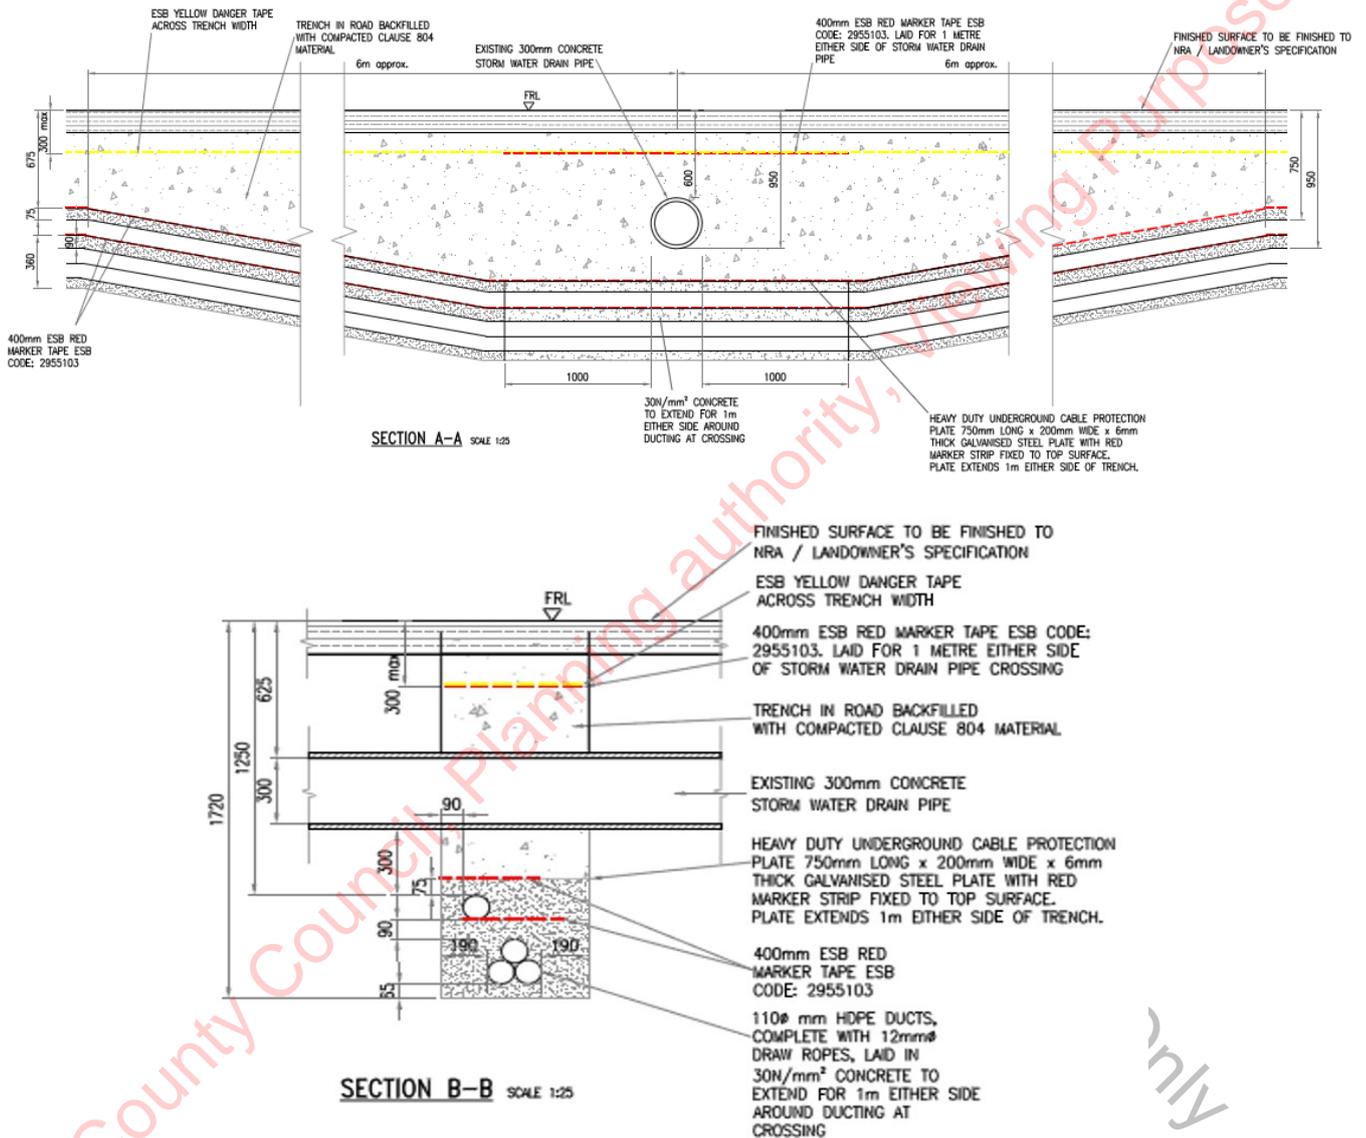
Piped Culvert Crossings - Ducting under Culvert Crossing Details
